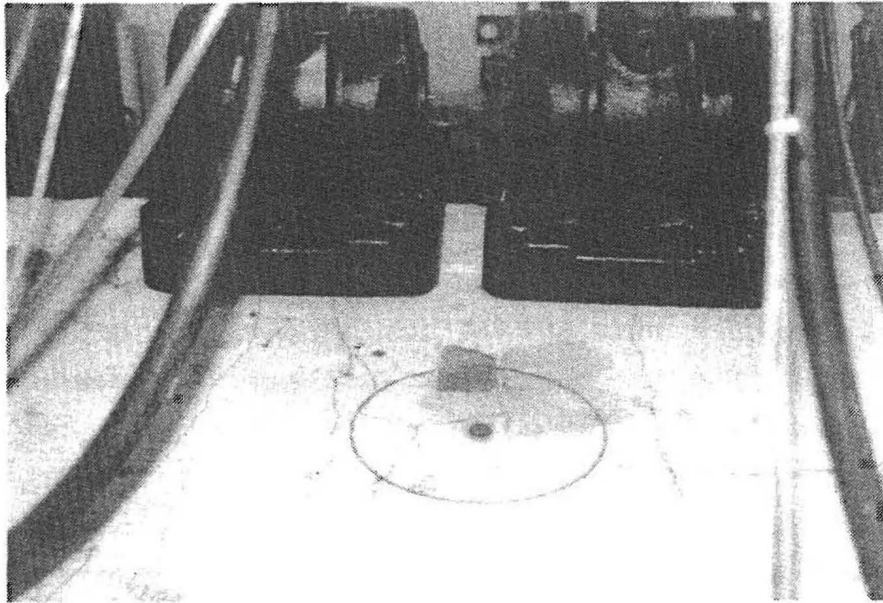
Experimental Setup Used to Apply Shear Failure Load
